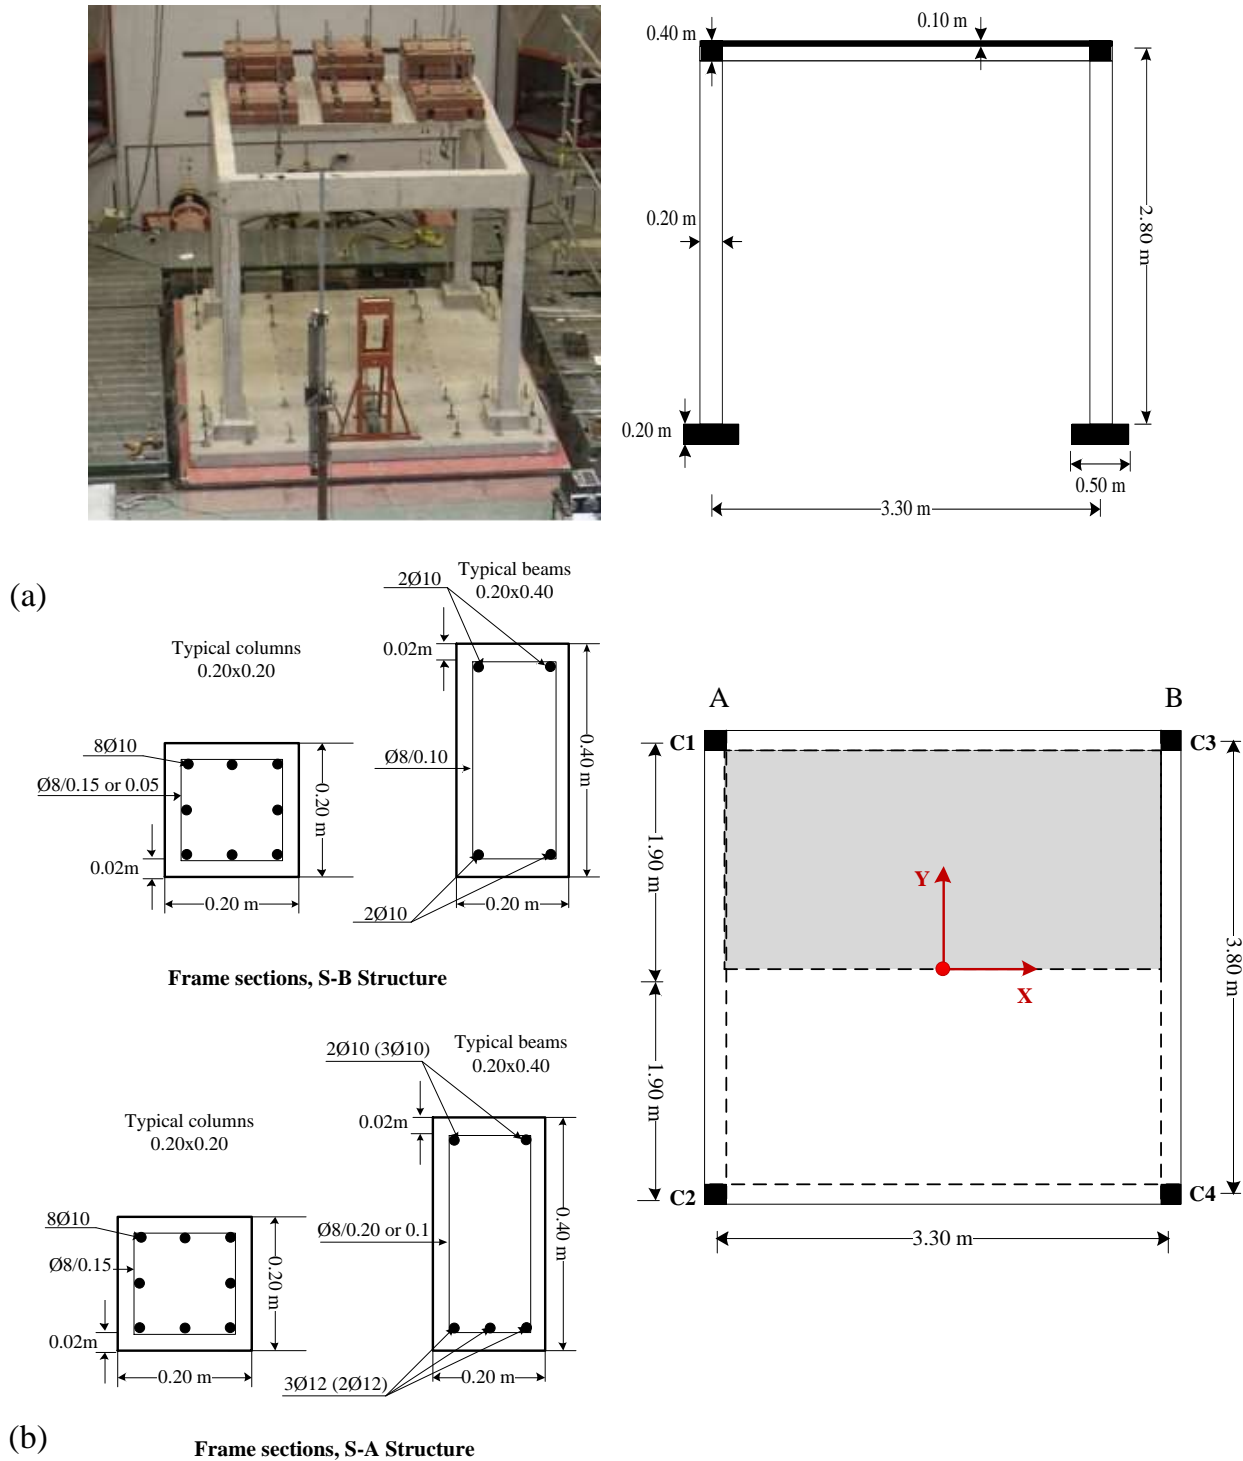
General configuration of the reference structures (i.e. S-A and S-B frames): (a) full-scale (3D) and elevation views (b) plan-view, beam-column section dimensions and their reinforcement details [14].
